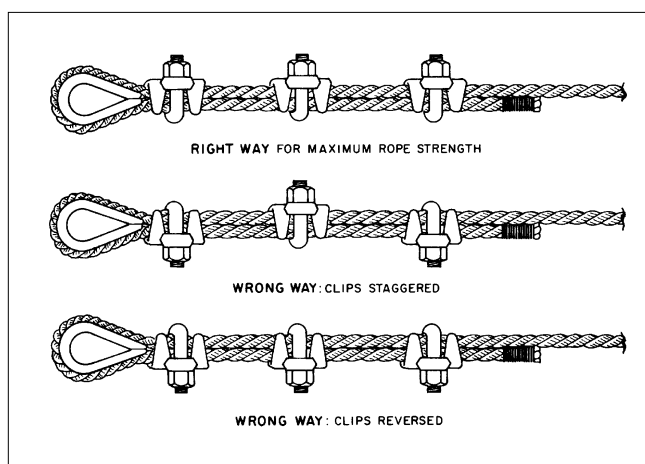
The correct way to attach wire rope clips. Courtesy of the Wire Rope Technical Board.
